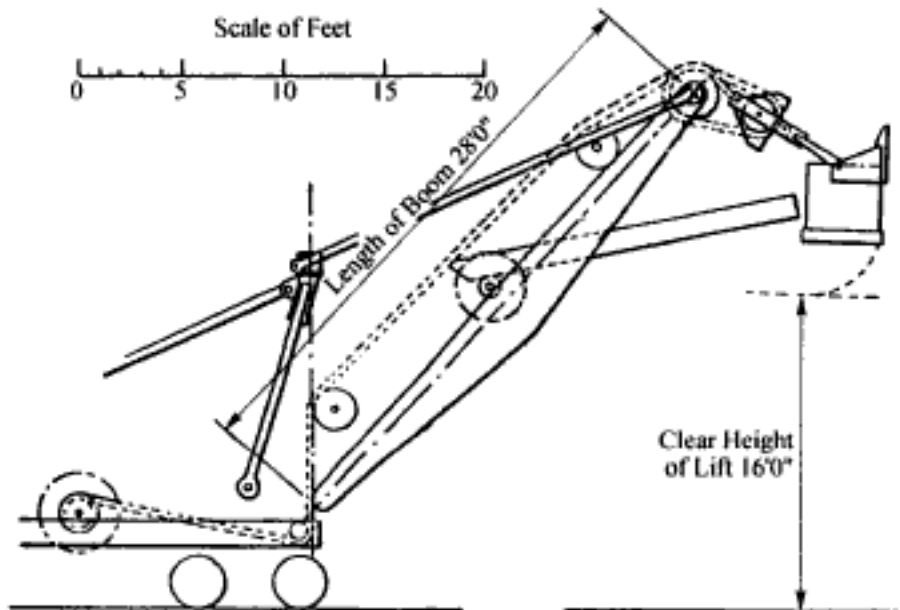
Drawing of the front end of a standard shovel showing the hoisting and digging geometry (Van Barneveld, 1913).
